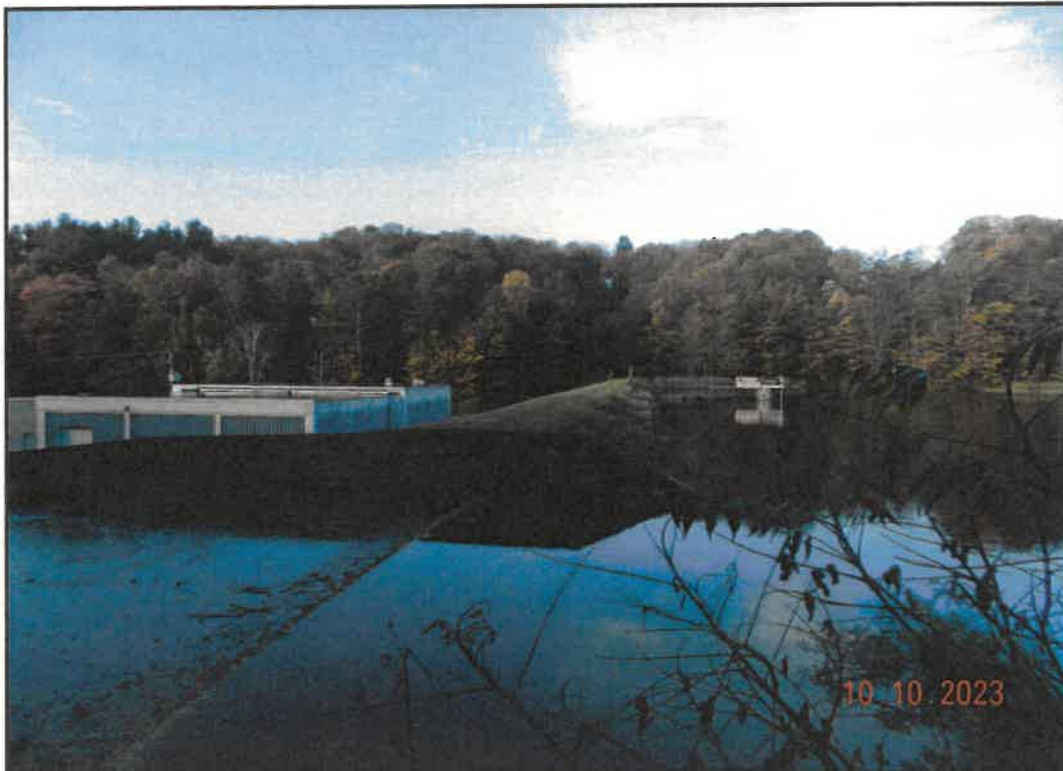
Spillway Entrance and Upstream Embankment looking Southwest
